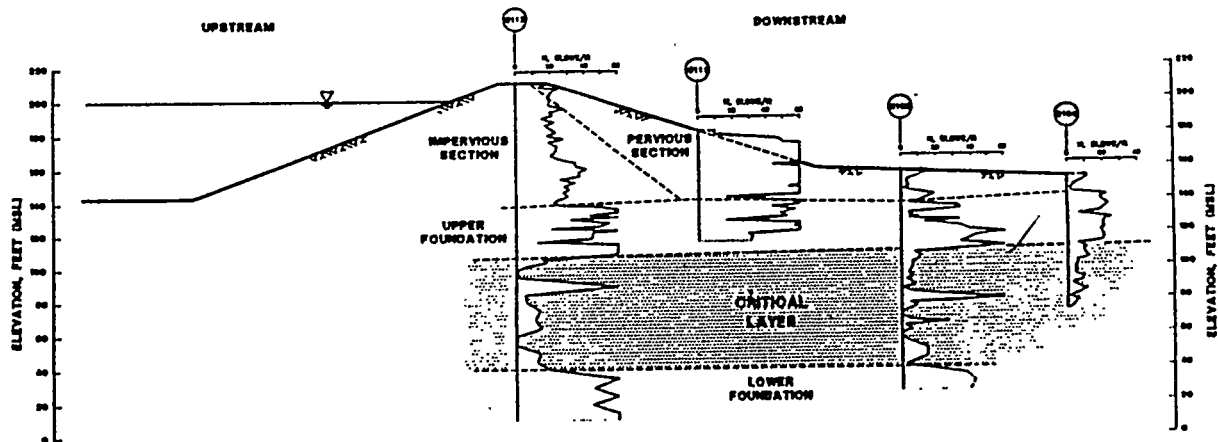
Par Pond Dam Cross Section - SPR Profile
